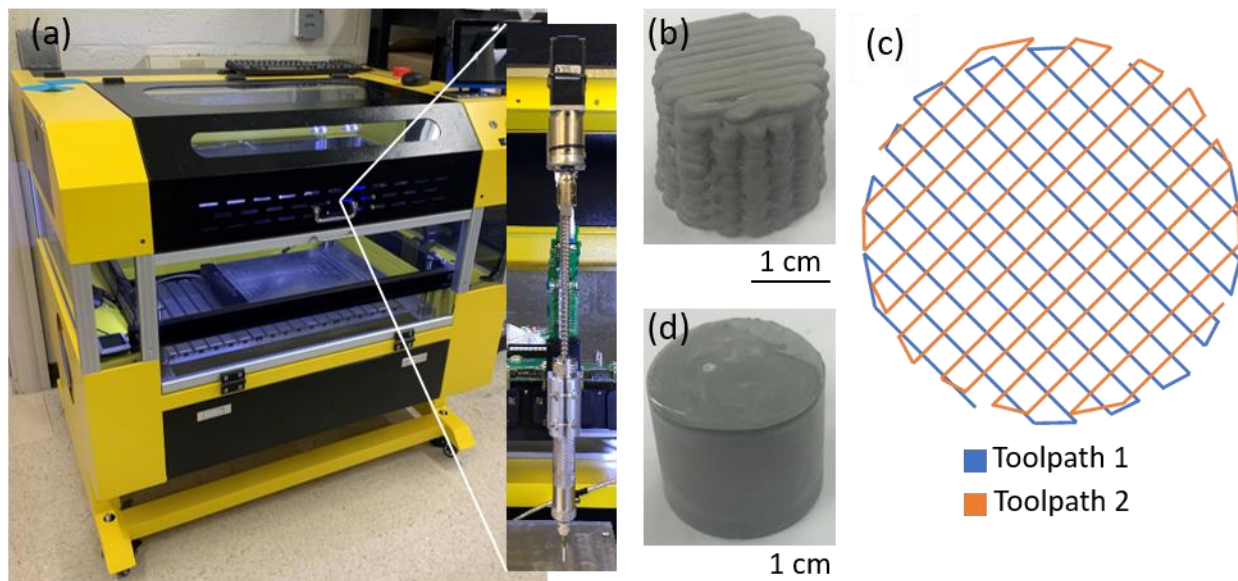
(a) Hydra 430 gantry model 3D printer used for printing cement pastes with the modular EMO-XT print head assembly which is mounted inside, (b) a 3D printed cement paste structure with a rectilinear pattern, (c) a diagram of the toolpath used (toolpath 1 and toolpath 2 are orthogonal from each other), and (d) a cast cement paste specimen.
